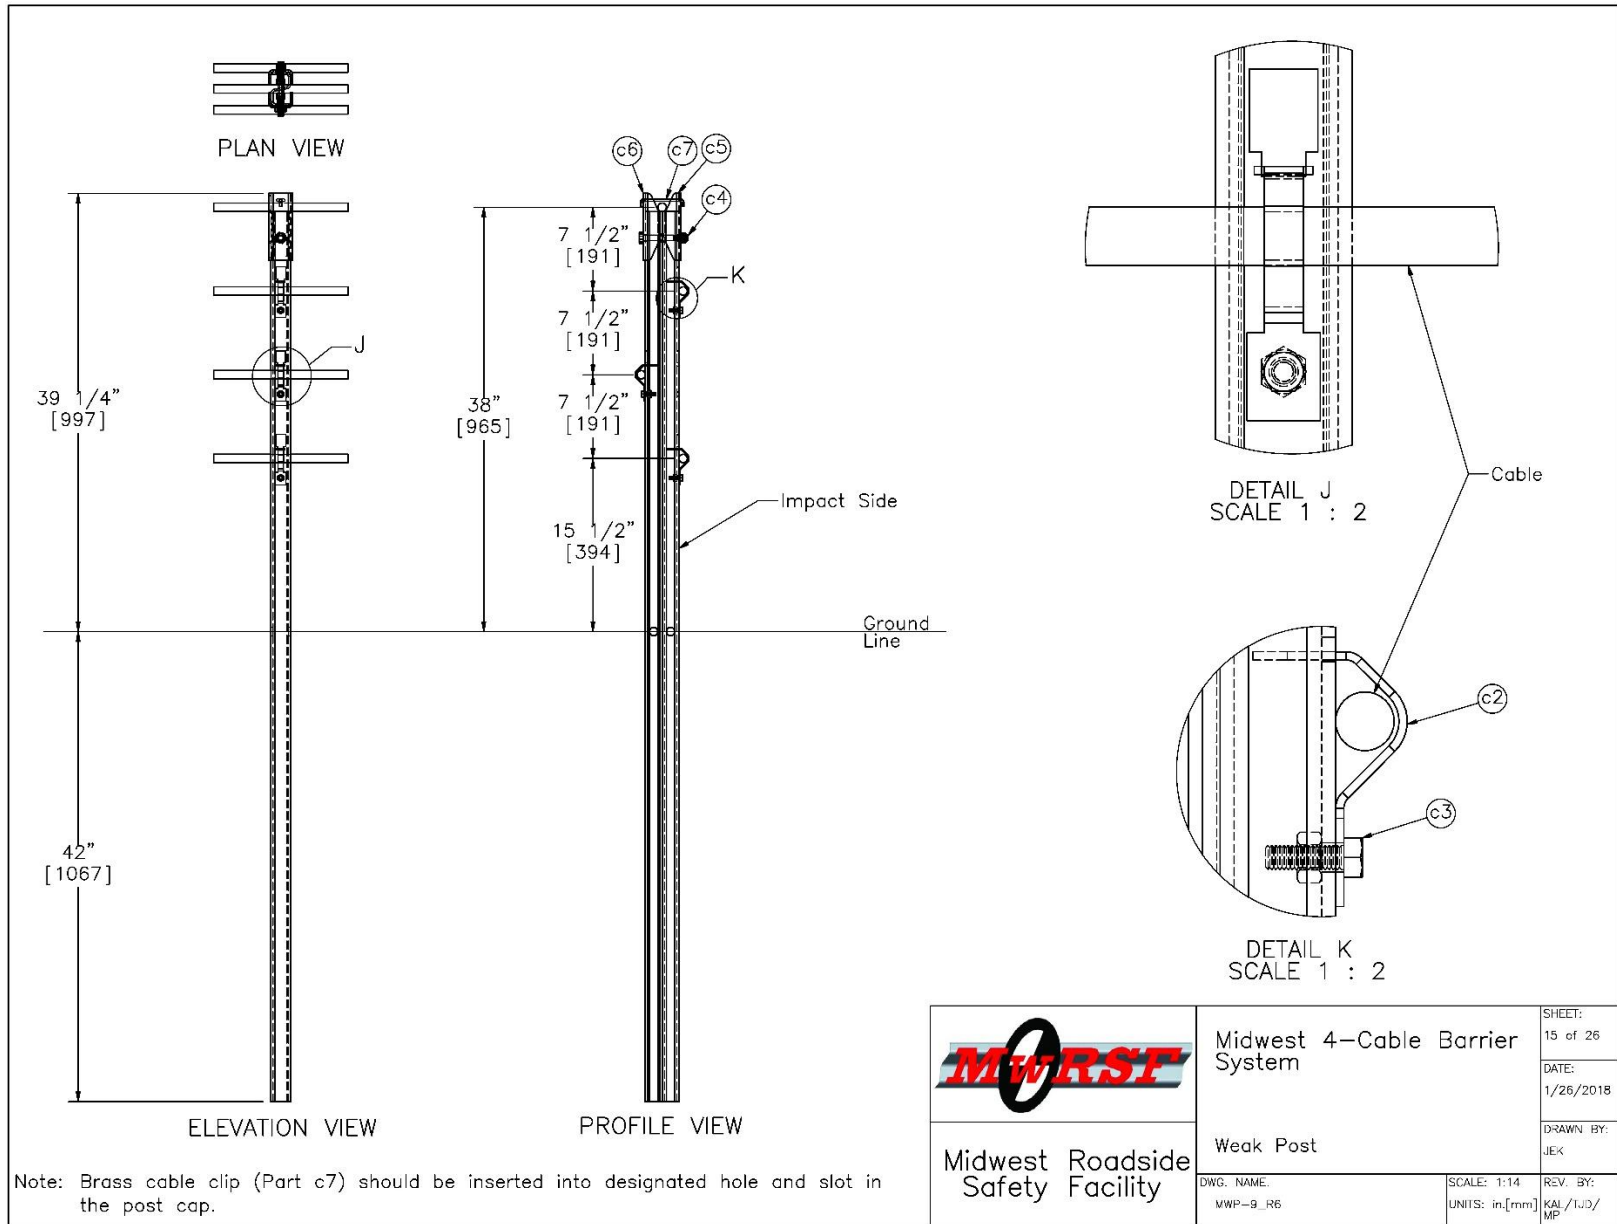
Midwest Weak Post (MWP) Details, Test No. MWP-9
